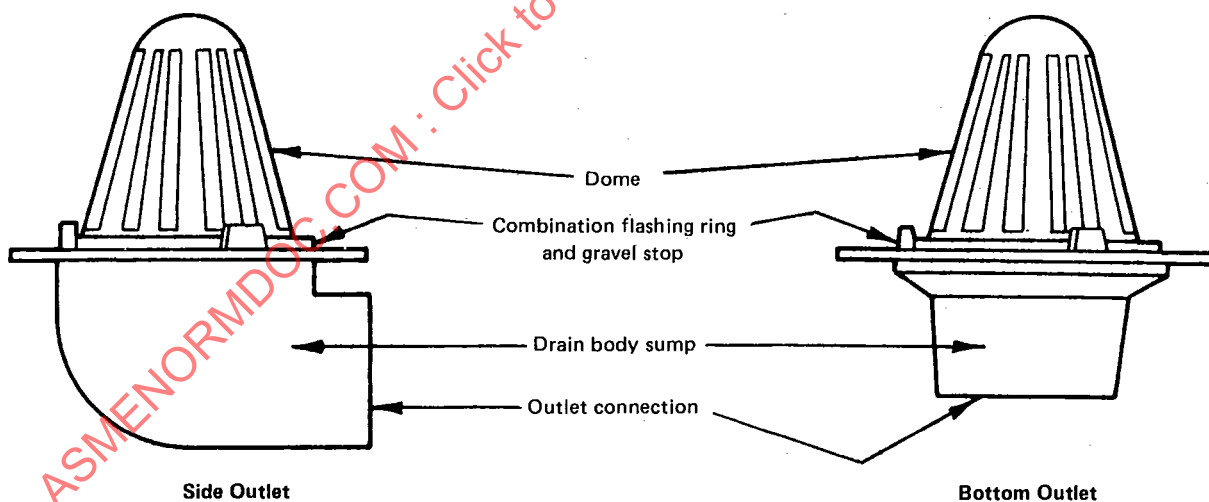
GUTTER OR CORNICE ROOF DRAIN
